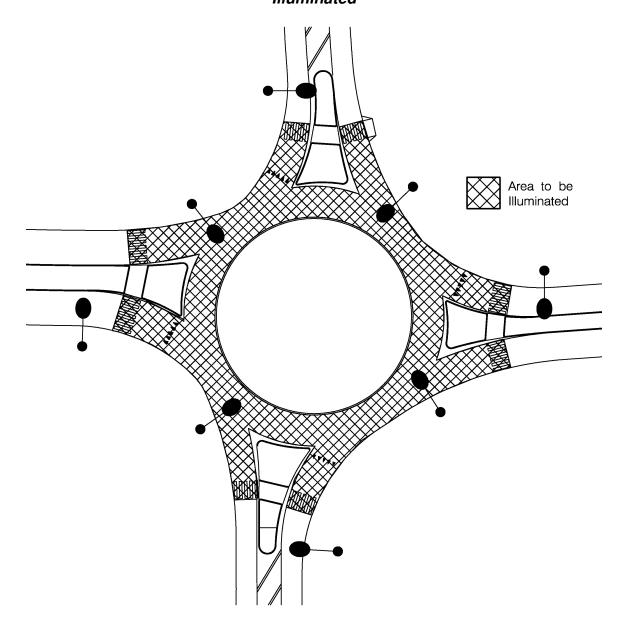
Roundabout, Typical Lighting Layout and Area to be Illuminated
